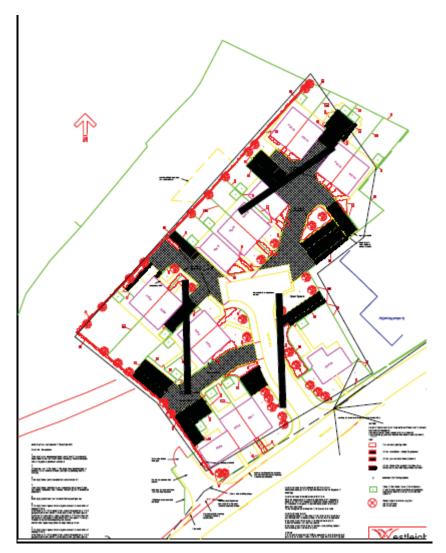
Site Layout with proposed trial trenches (not to scale)
